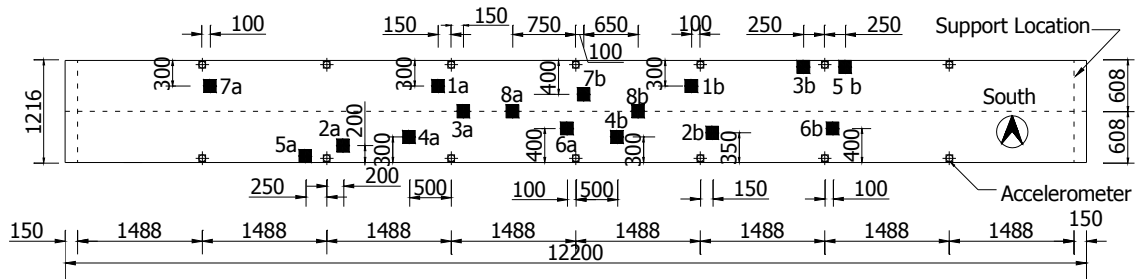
Schematic plan of the girder showing locations of damage and sensors (dimensions in mm)
